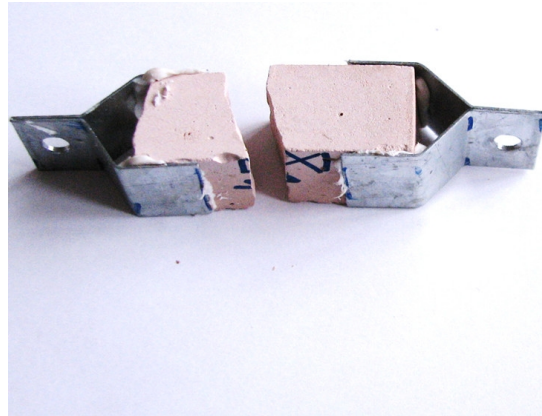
Damaged specimen equipped by steel extensions after tensile test.
